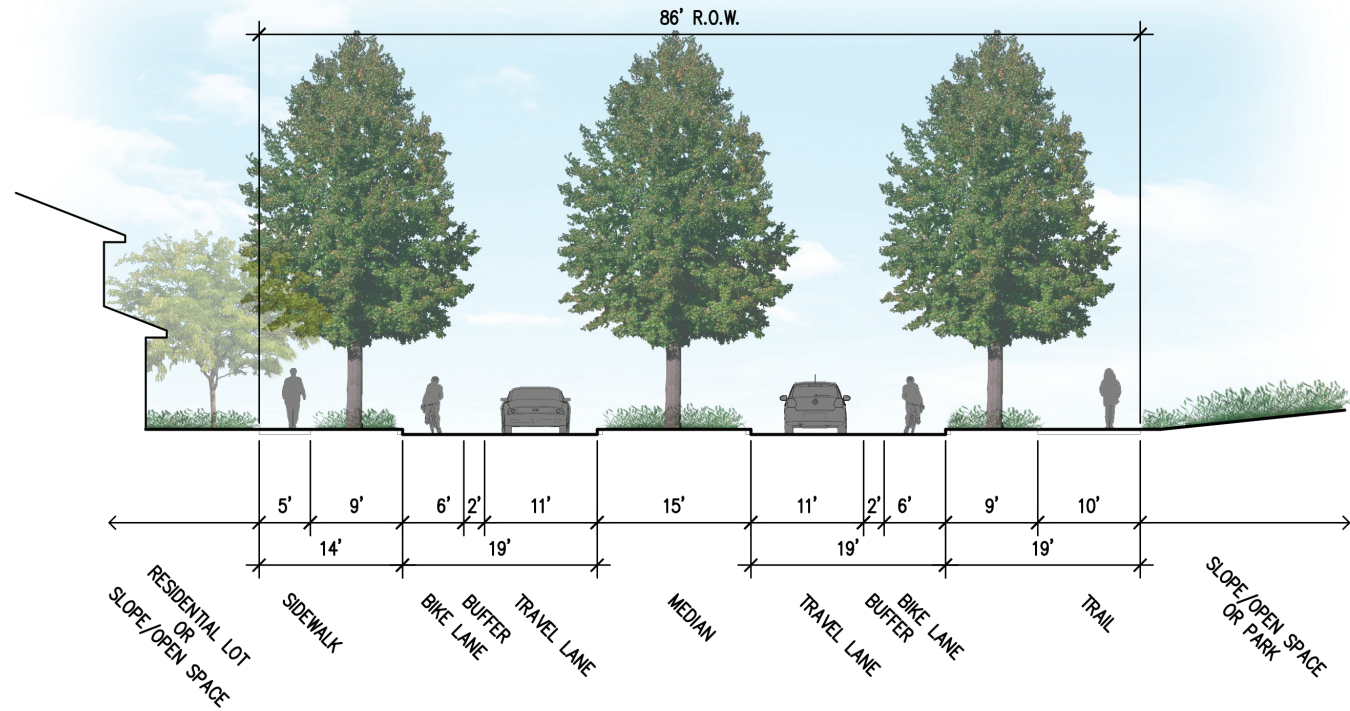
TYPICAL CROSS SECTION OF CARROLL CANYON ROAD WEST (4 LANE URBAN MAJOR)
